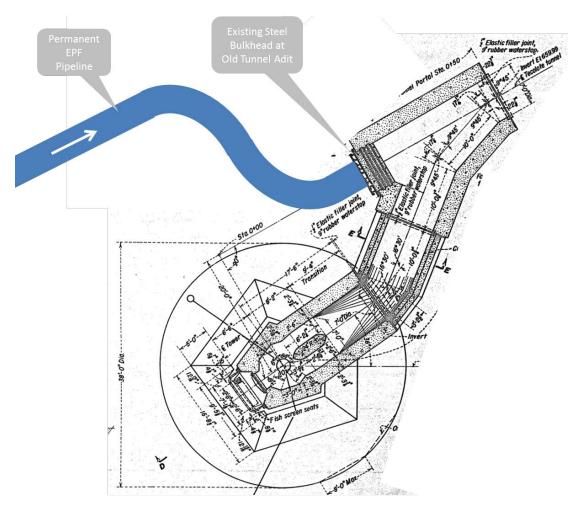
Proposed Pipeline Connection to Tunnel Adit
